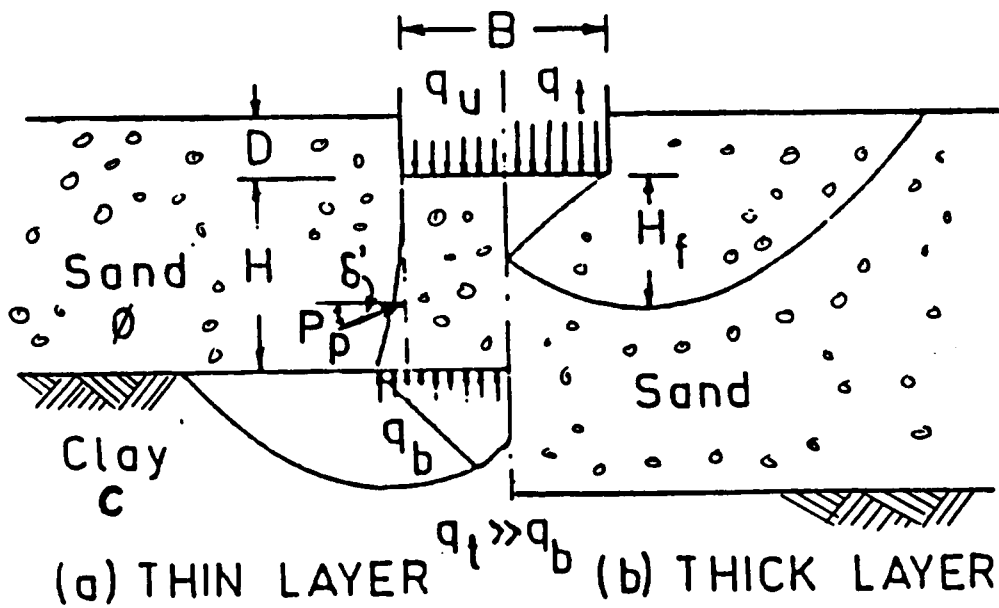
Failure of soil below footing on dense sand layer above soft clay (Meyerhof 1974).
